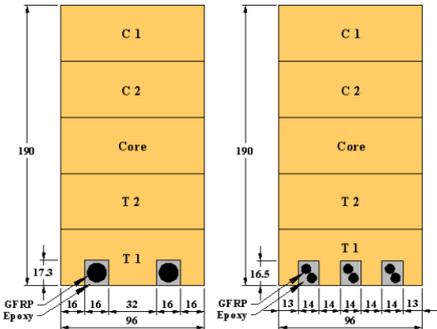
Reinforcement arrangement for repaired 190mm deep beams.
